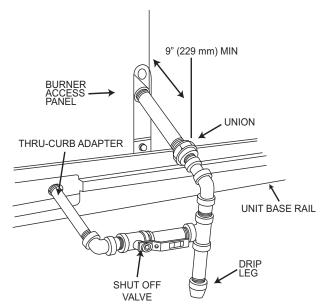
Gas Piping with Thru-Curb Accessory (Alternate Layout)
